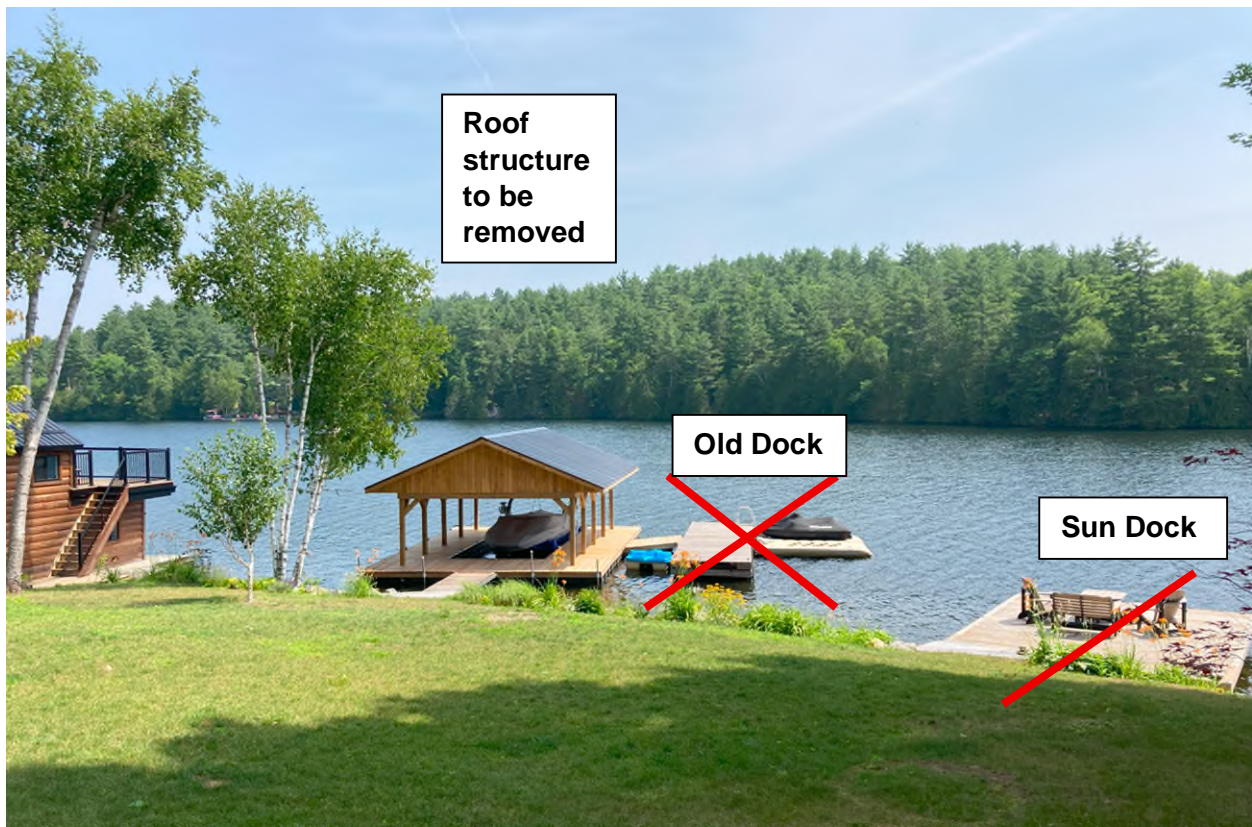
Site visit photo showing current conditions and the structures that will be removed and retained.
